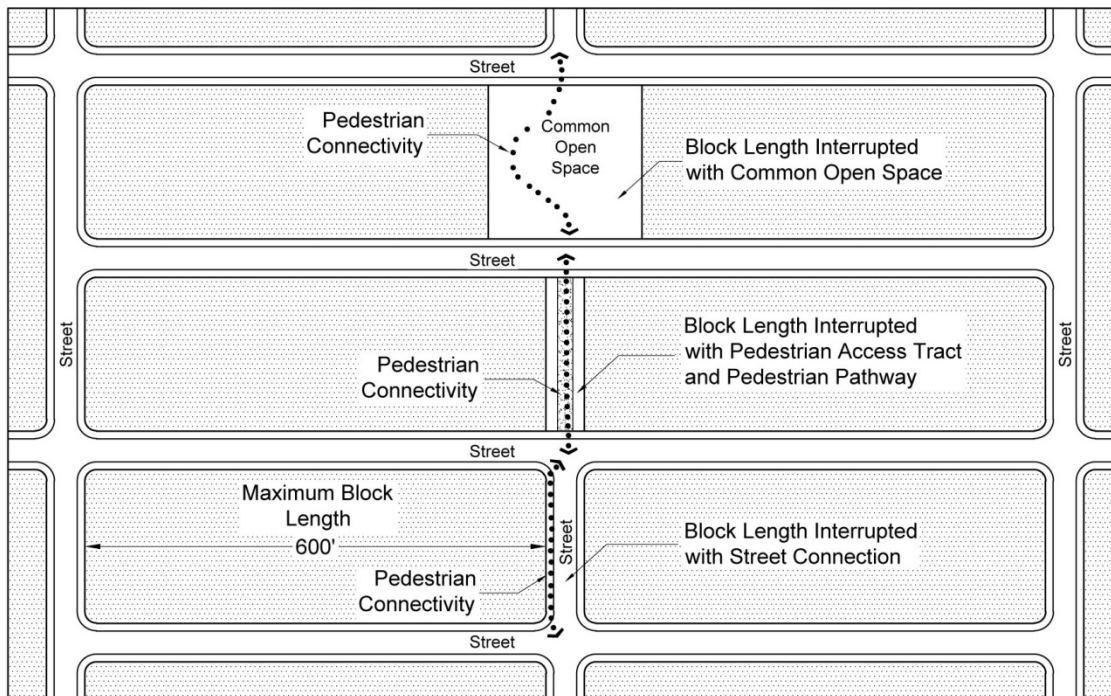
(a).2. – Site Layout – Block Length Standards
